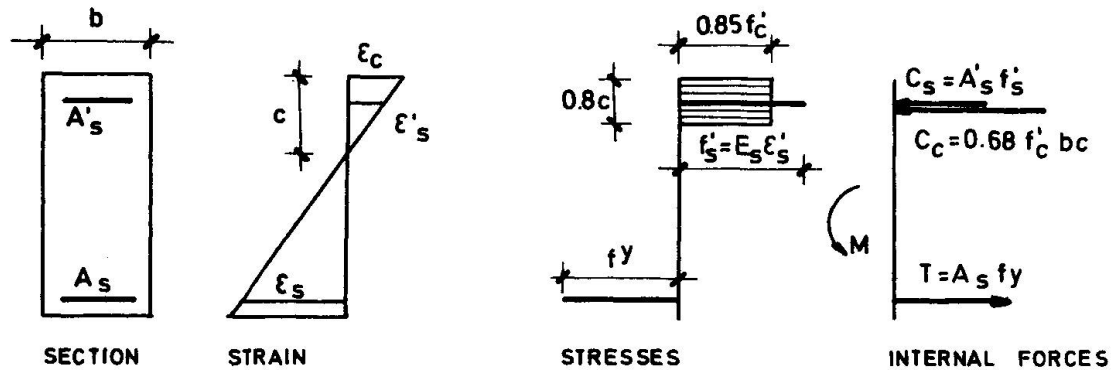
Scheme for computation of a monotonously loaded reinforced concrete section
